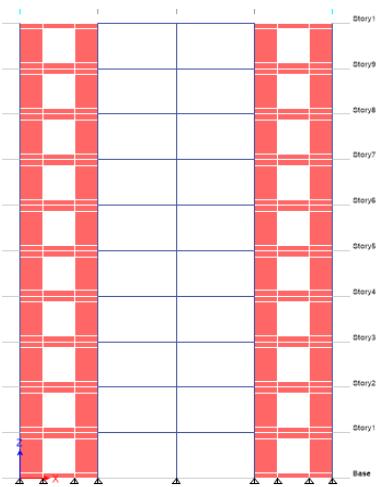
Elevation of the Frame Shear Wall Building With Vertical Opening
